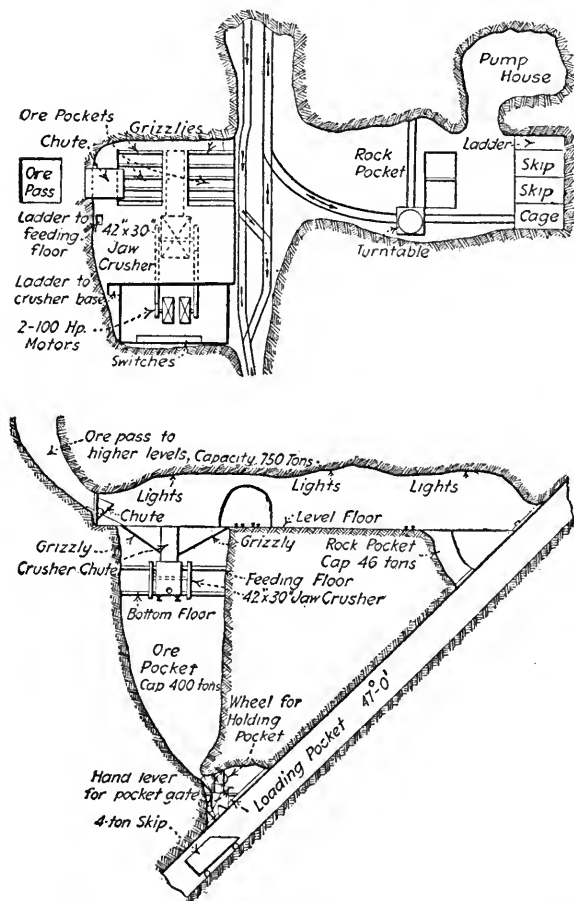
ARRANGEMENT OF UNDERGROUND STATION, CRUSHER AND POCKET.
